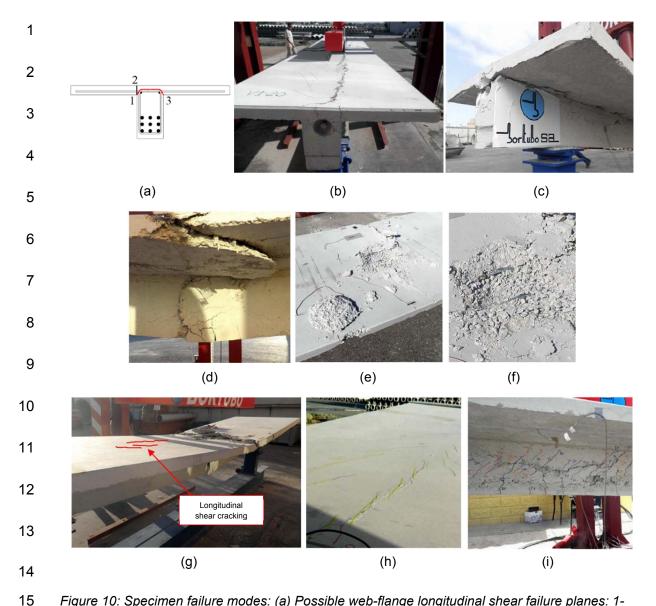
Specimen failure modes: (a) Possible web-flange longitudinal shear failure planes: 1-2 vertical plane, 1-3 horizontal plane; (b) Web-flange longitudinal shear H (V3-0); (c) Web-flange longitudinal shear V (V1-20); (d) Bending failure (V2-30): web and flange bottom part view; (e) Bending failure (V2-30): flange top side view (concrete crushing); (f) Bending failure (V2-30): compressed reinforcement buckling detail; (g) Bending with longitudinal shear cracking (V3-20), general post-test specimen view; (h) Bending with longitudinal shear cracking (V3-20), detail of shear cracks on the flange top side; (i) Vertical shear H, due to the presence of hollows in concrete (V1-40).
